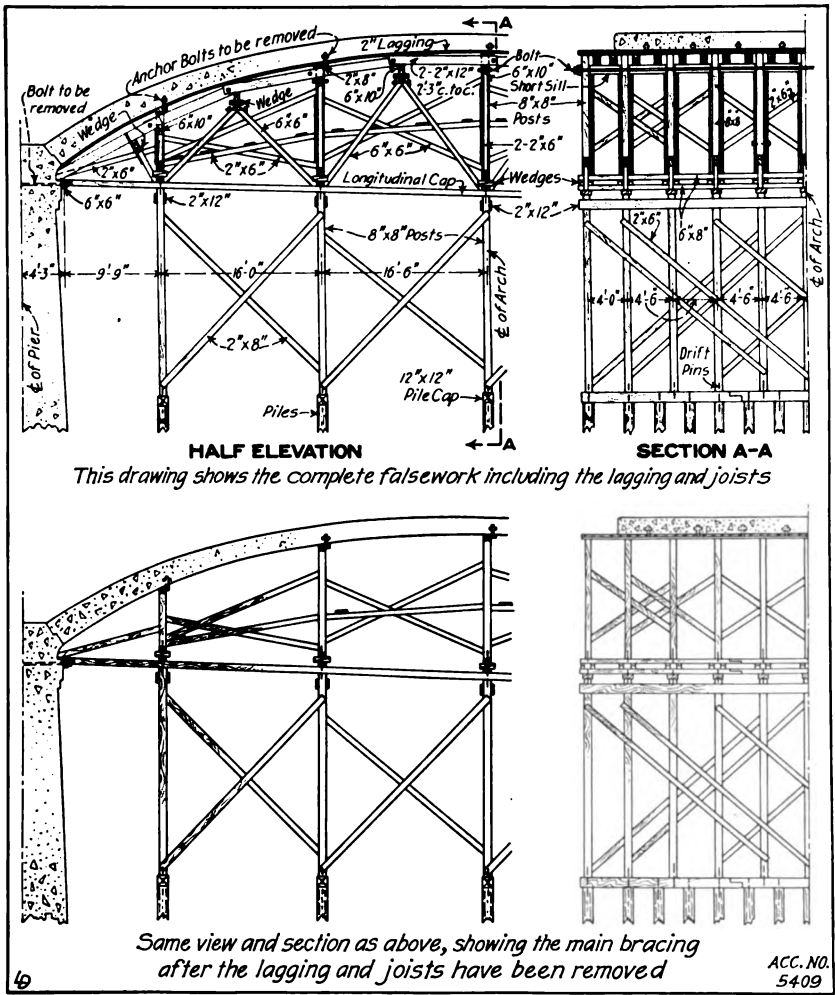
DETAILS OF FALSE WORK FOR ARCHES OF BLACK STREET BRIDGE AT HAMILTON
